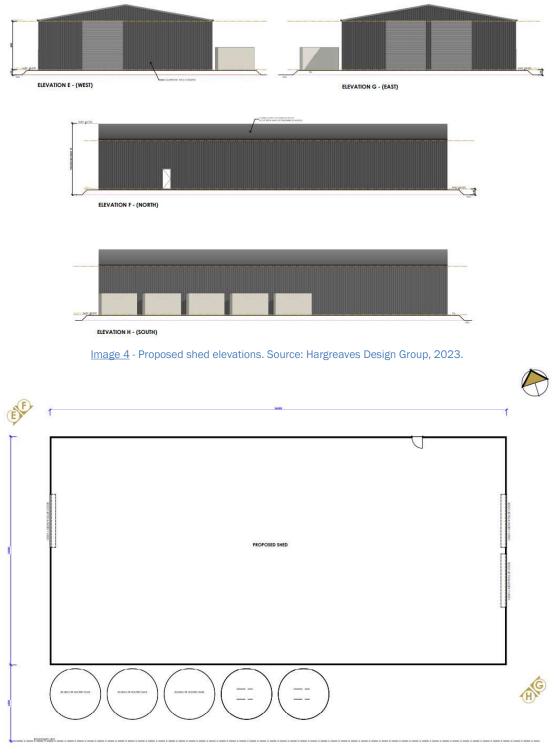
Proposed shed outline. Source: Hargreaves Design Group, 2023
